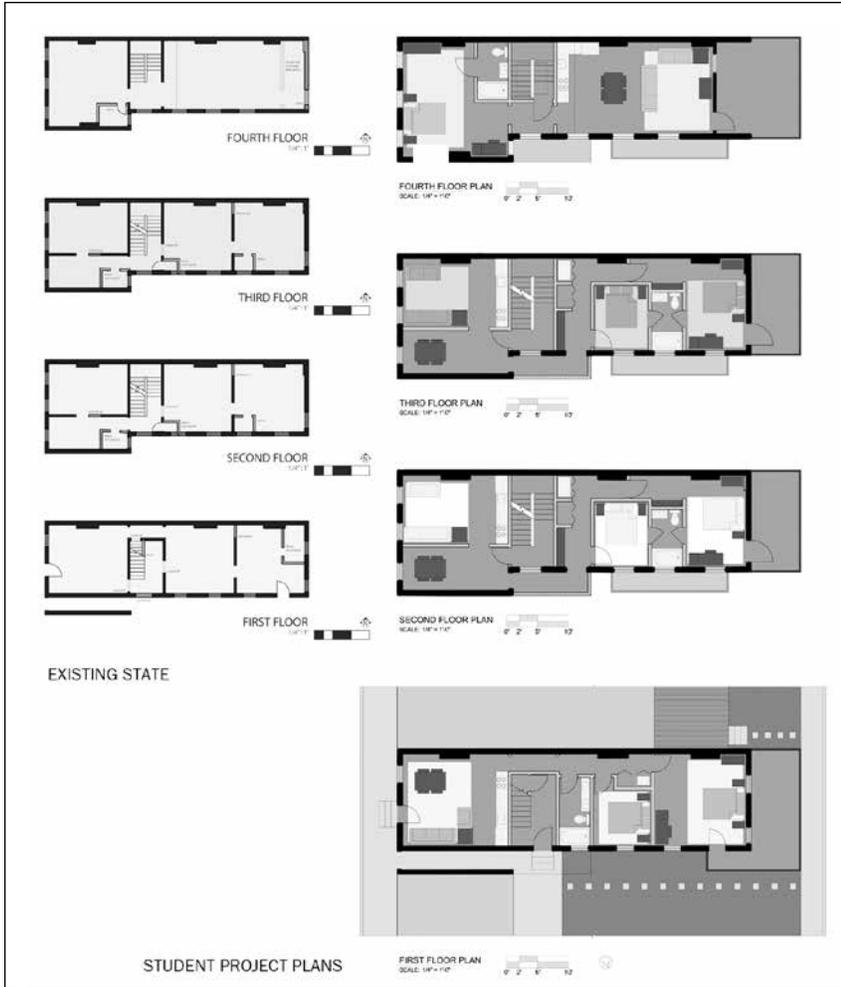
Floor plans of 1420 Pleasant Street by student design team members Maria Bergh, Wade Hart, Lauren Karsten, James Kehl, and Joseph McGovern.
